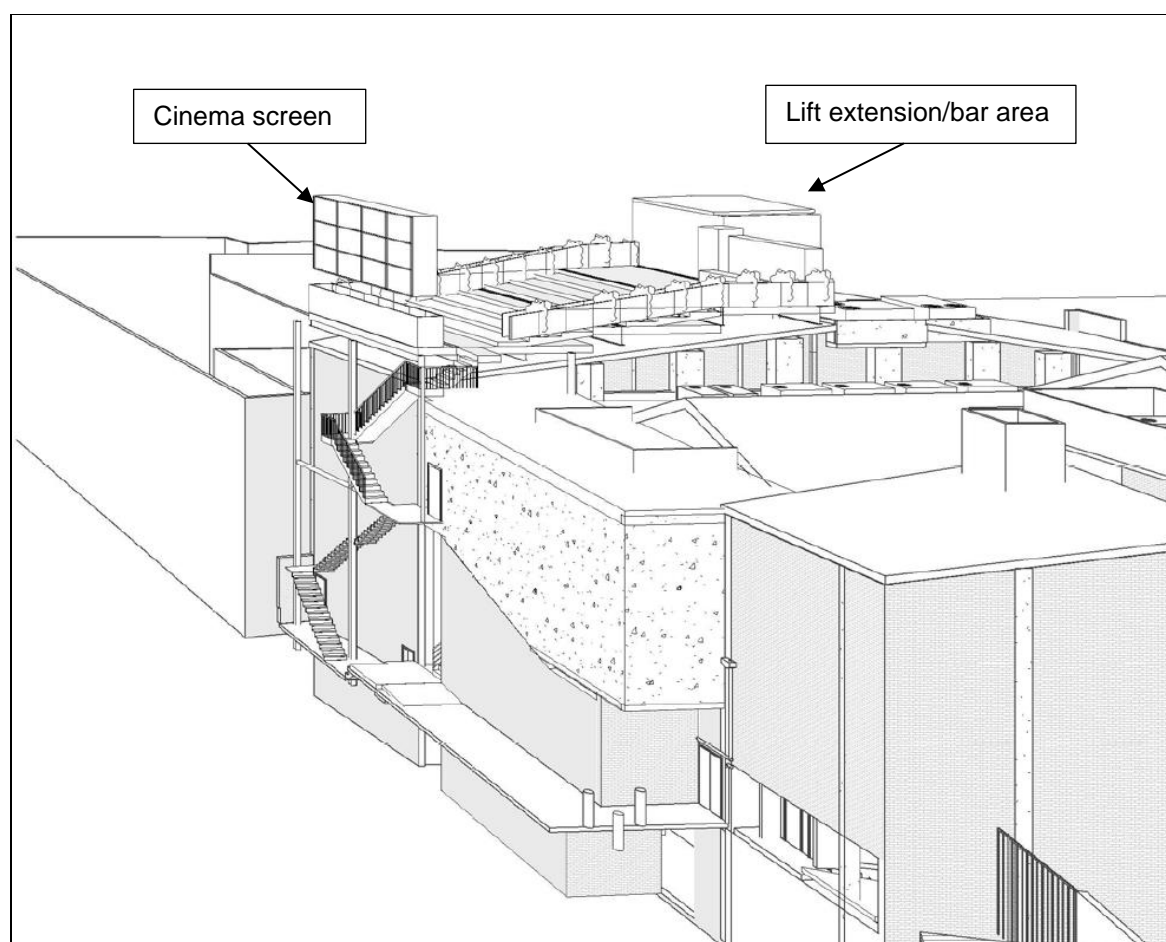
3D birds eye view looking from the laneway at the rear of the site
